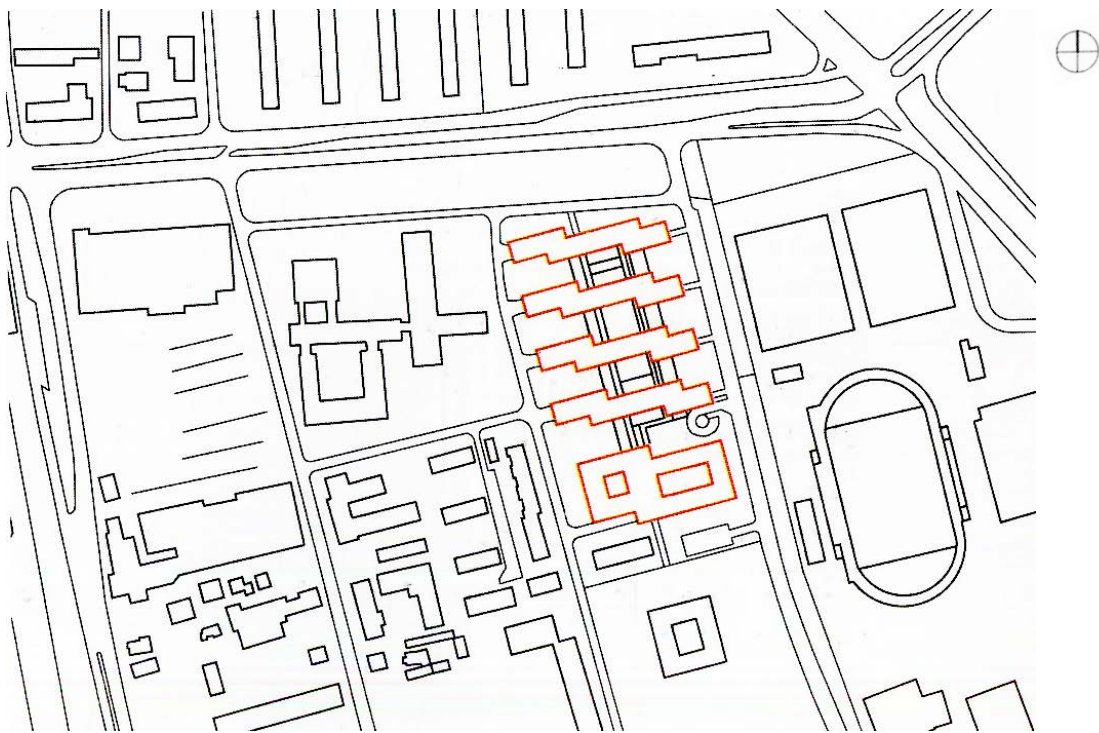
Office complex, Wiesbaden, Site plan depicting the linkage of the four new structures with the existing building via two access corridors in the context of the surroundings.
